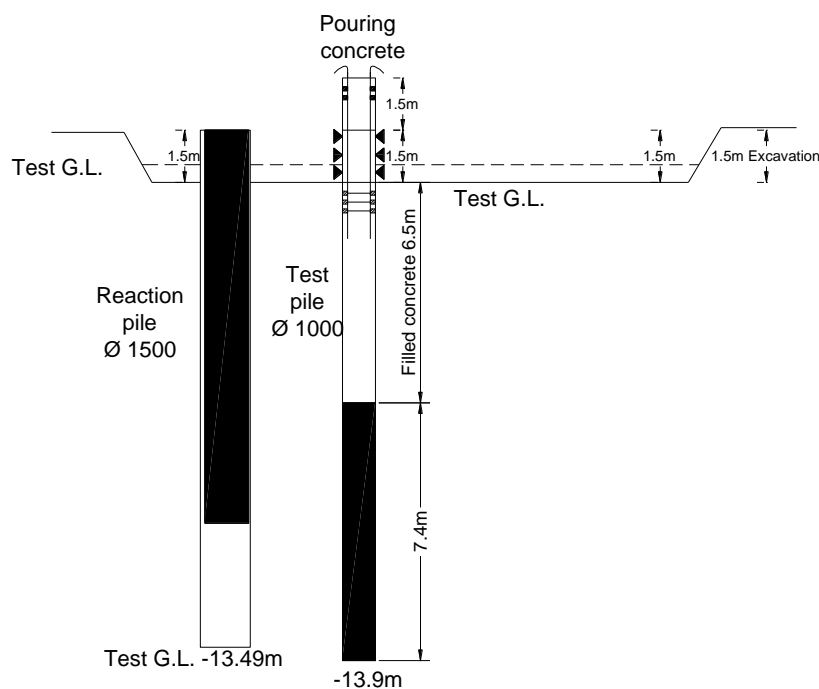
Geometry and configuration of the full-scale concrete-filled steel pipe pile specimen.
